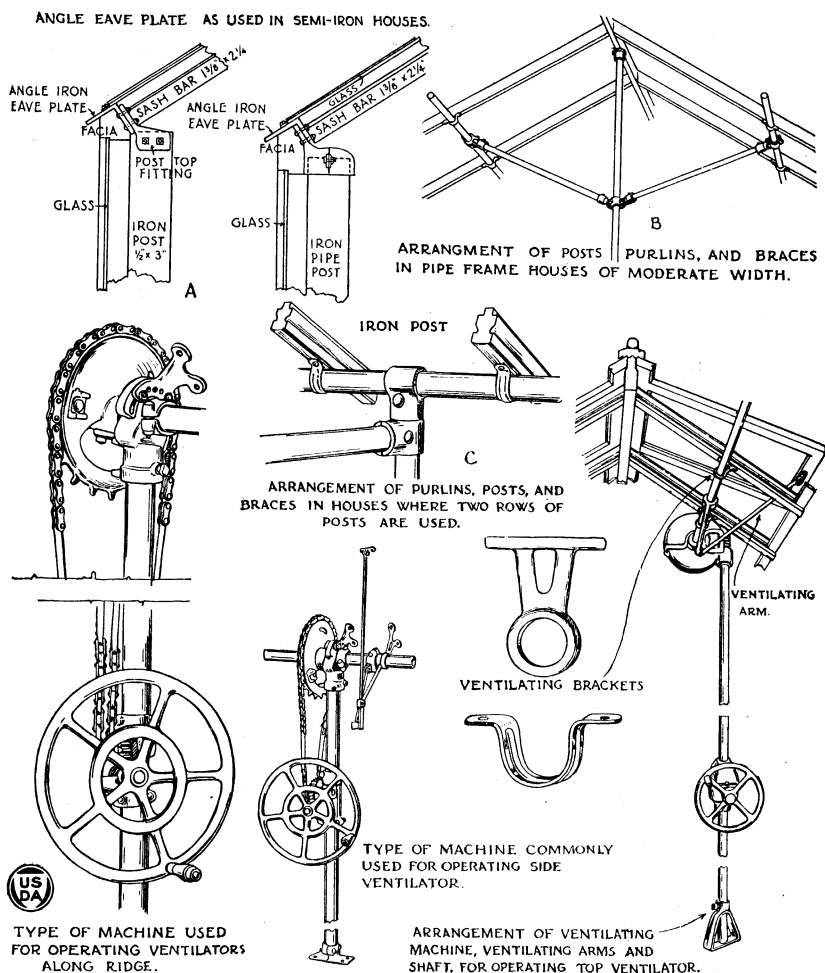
Details of construction of special features for a wooden or semi-iron greenhouse: A, Iron and iron-pipe posts with special top fittings. B, Arrangement of inside posts and braces where one row of inside posts is used. C, When two rows of posts are used they are usually placed under the purlins and tied together as shown.
